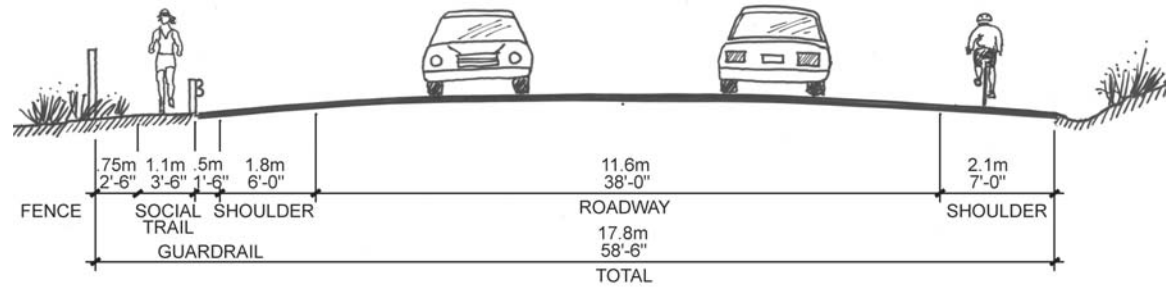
Existing Conditions at Lincoln Boulevard at Kobbe Avenue
